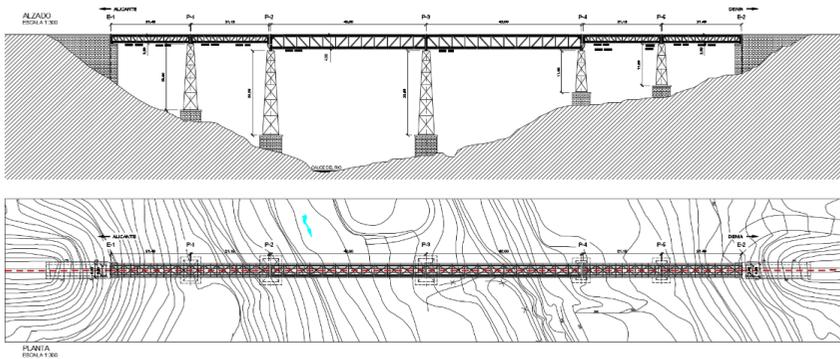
Ground and elevation plan of the Santa Ana viaduct.
